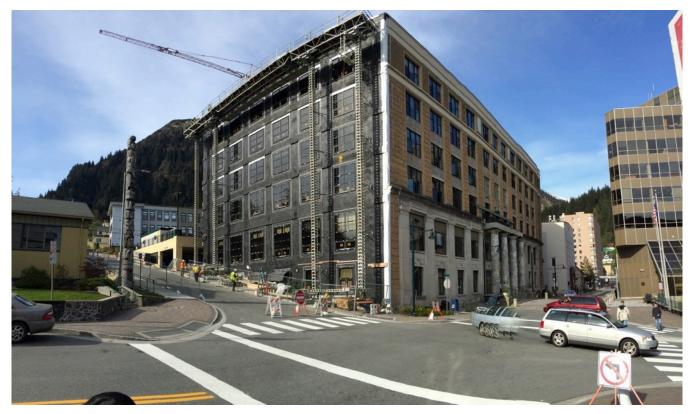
New Concrete Shear Walls & Windows, W. Side
